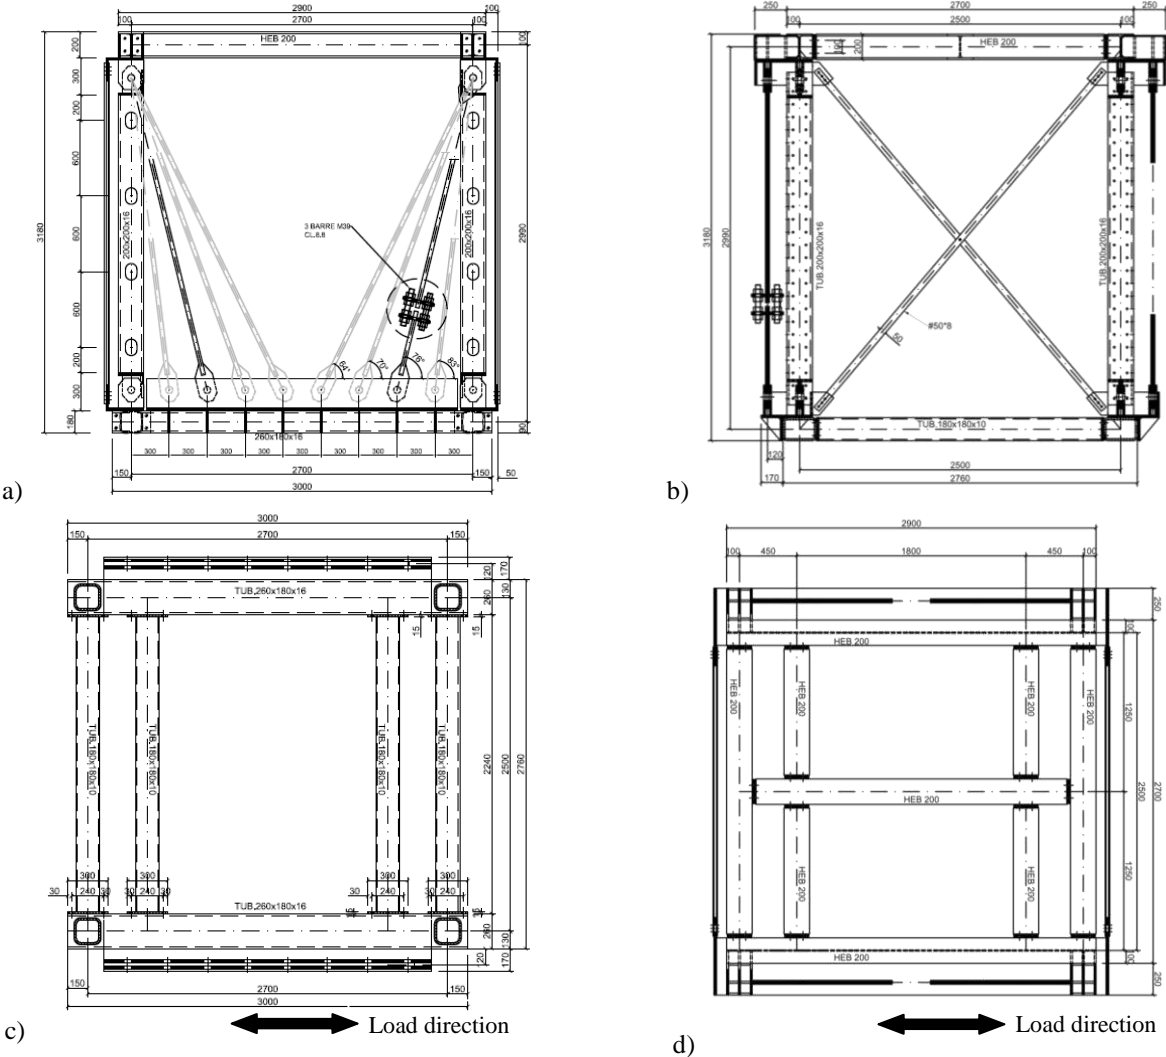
Set-up for shaking table tests: a) special eccentric bracing system, b) X-bracing system; c) bottom beam grid, d) top beam grid
